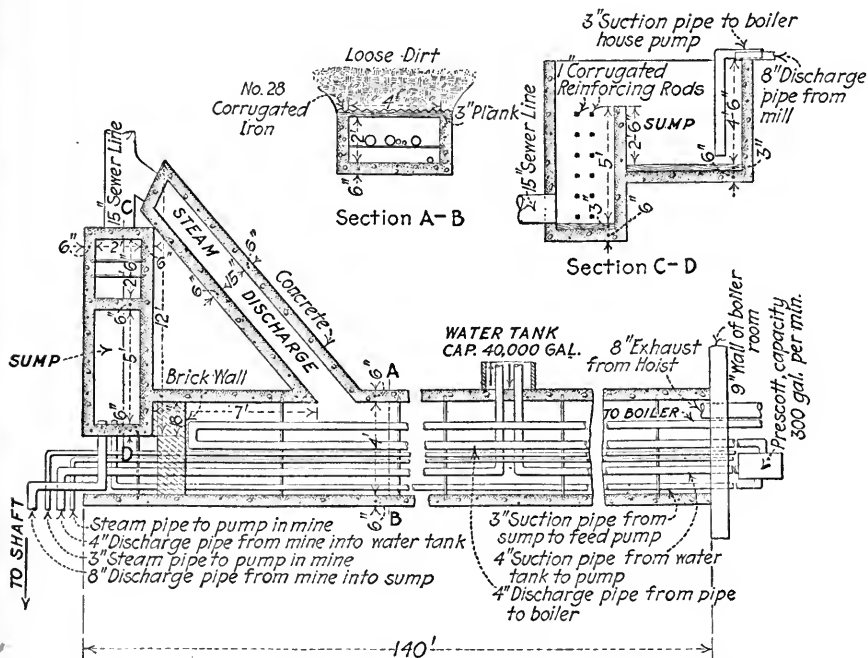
WATER AND STEAM PIPES IN CONCRETE-LINED TRENCH.
